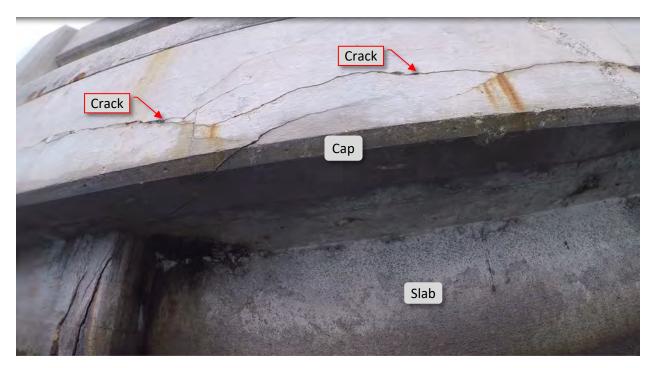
C12. STA 6+14 - 6+21. Crack at cap's bottom and vertical faces.
